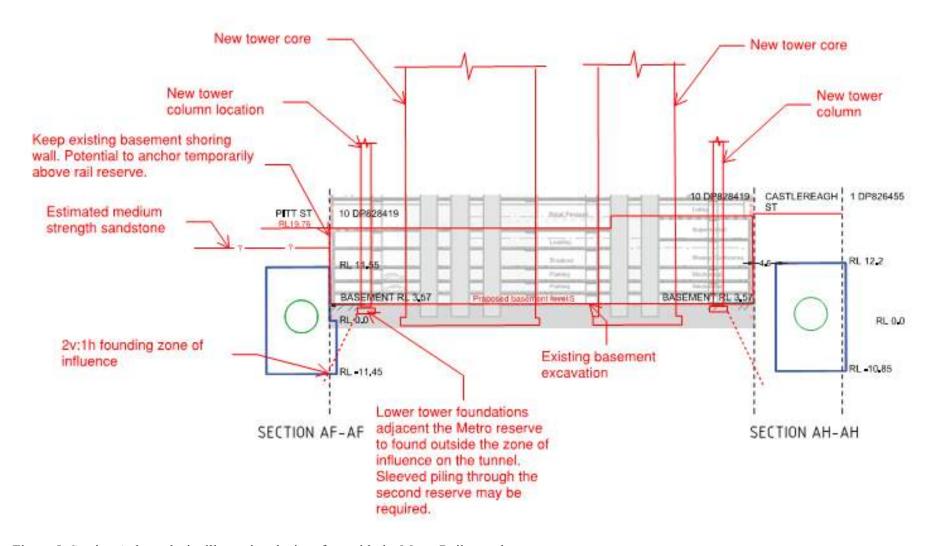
Section A through site illustrating the interface with the Metro Rail tunnels
